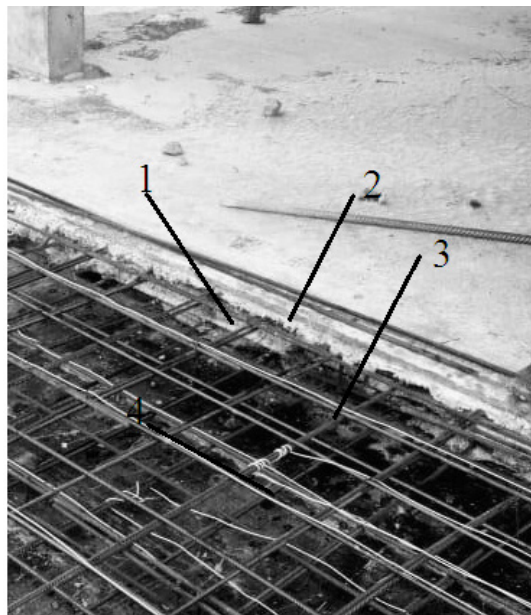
Construction joint structure: 1 - metal grid; 2 - protective concrete layer; 3 - top reinforcement; 4 - bottom reinforcement.
